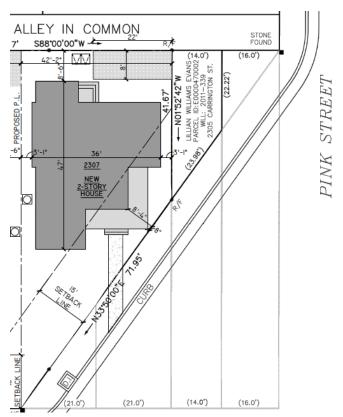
Site plan of proposed dwelling and intersection of Pink and Carrington Streets
